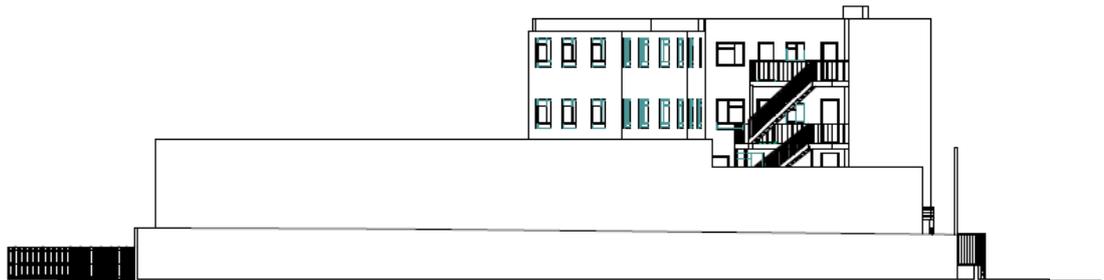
Existing side elevation of the site facing north showing Compton Lodge on the far side.
